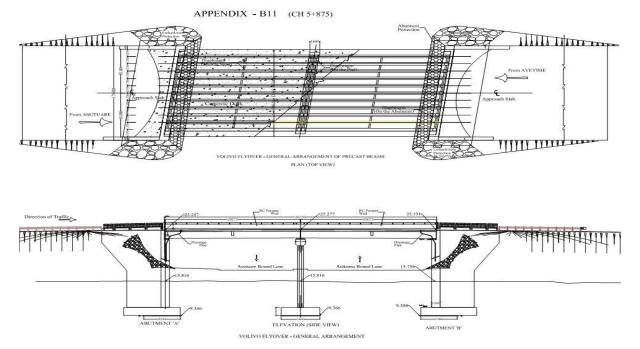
Bridge on Volivo Interchange at CH. 29+350 on Section 1 Project Road
